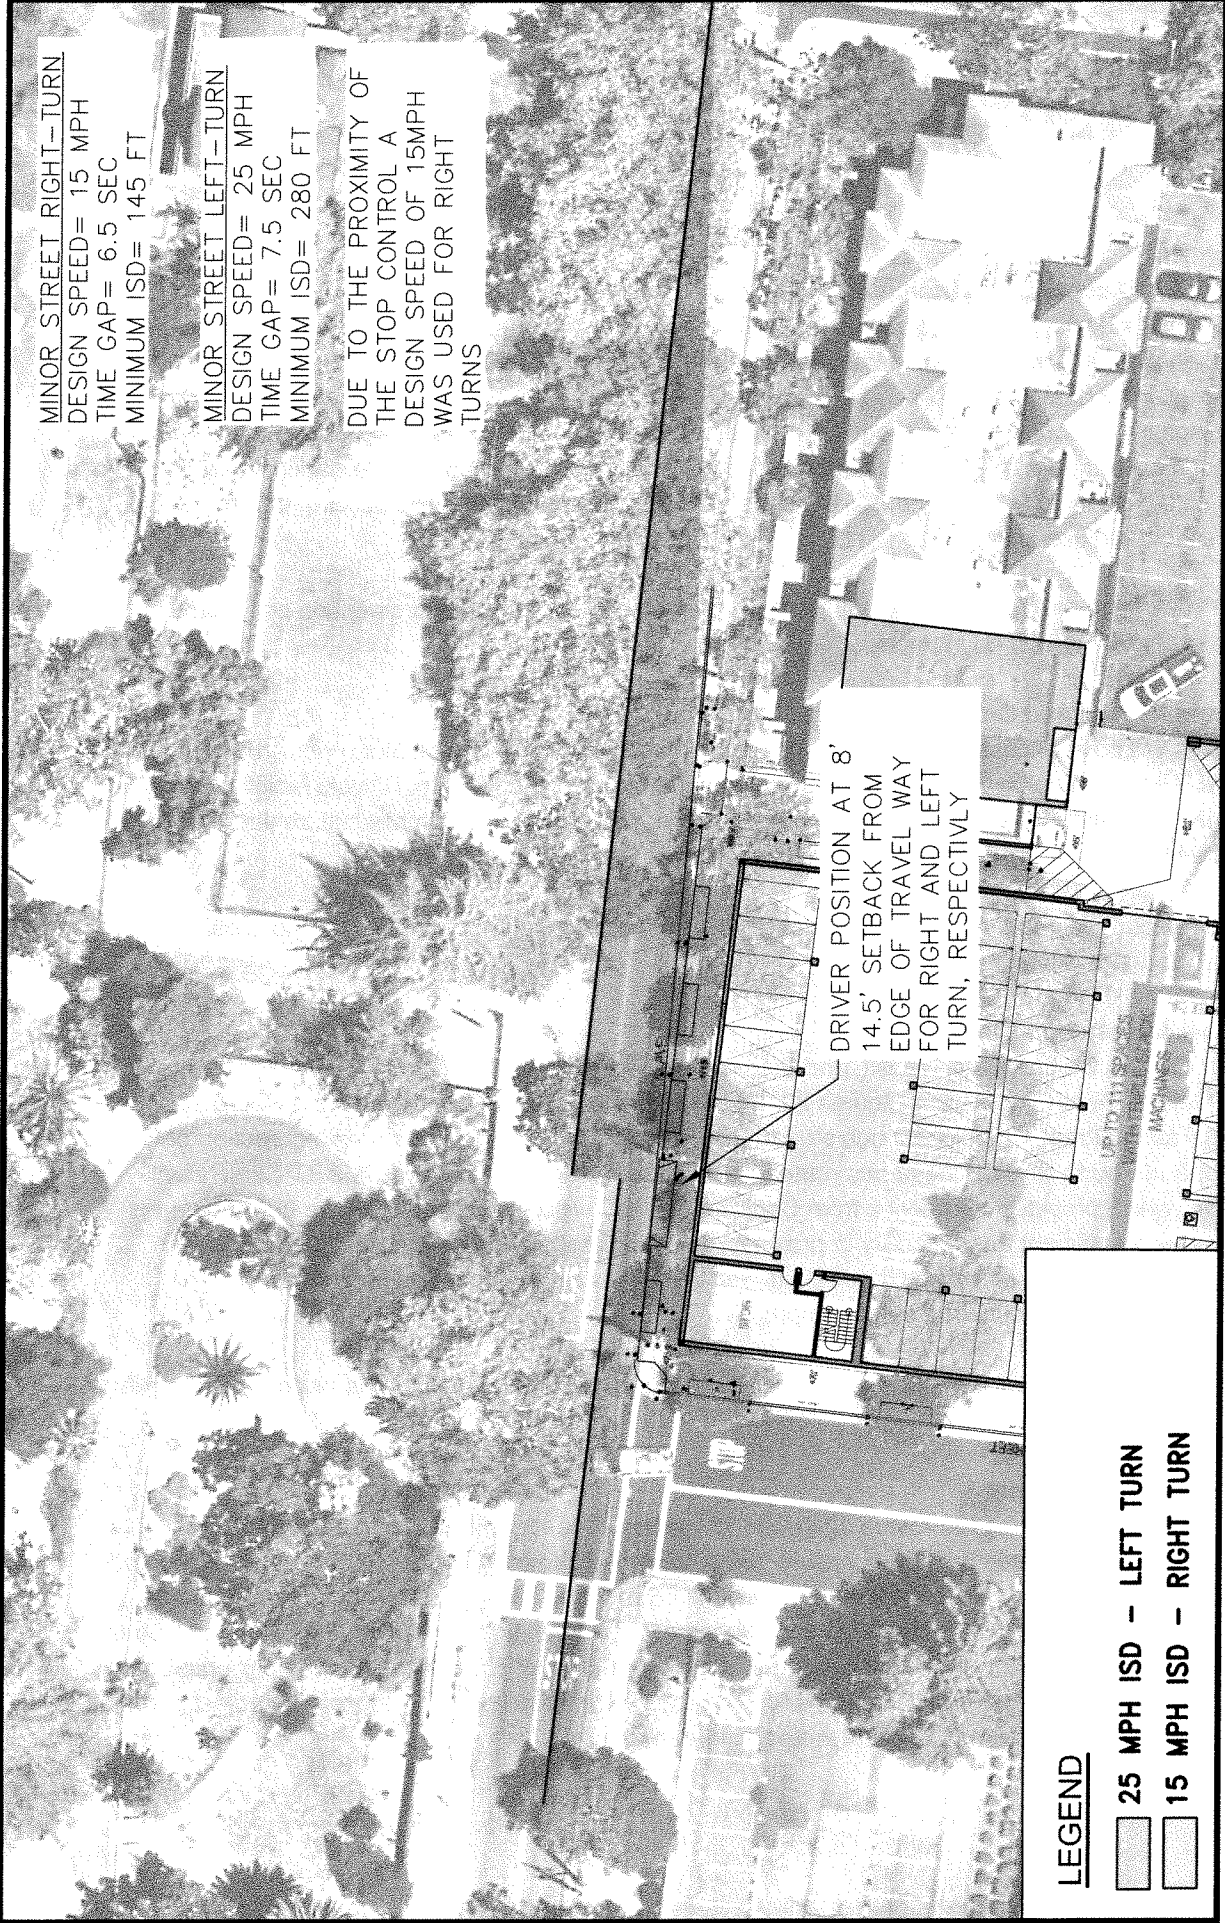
Except from Civil Sheet C1.2 (Mission Avenue Driveway)
